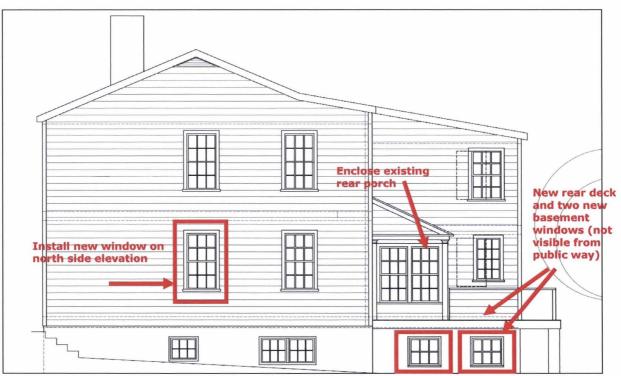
Proposed south (side) elevation with proposed new windows shown surrounded by red lines.
